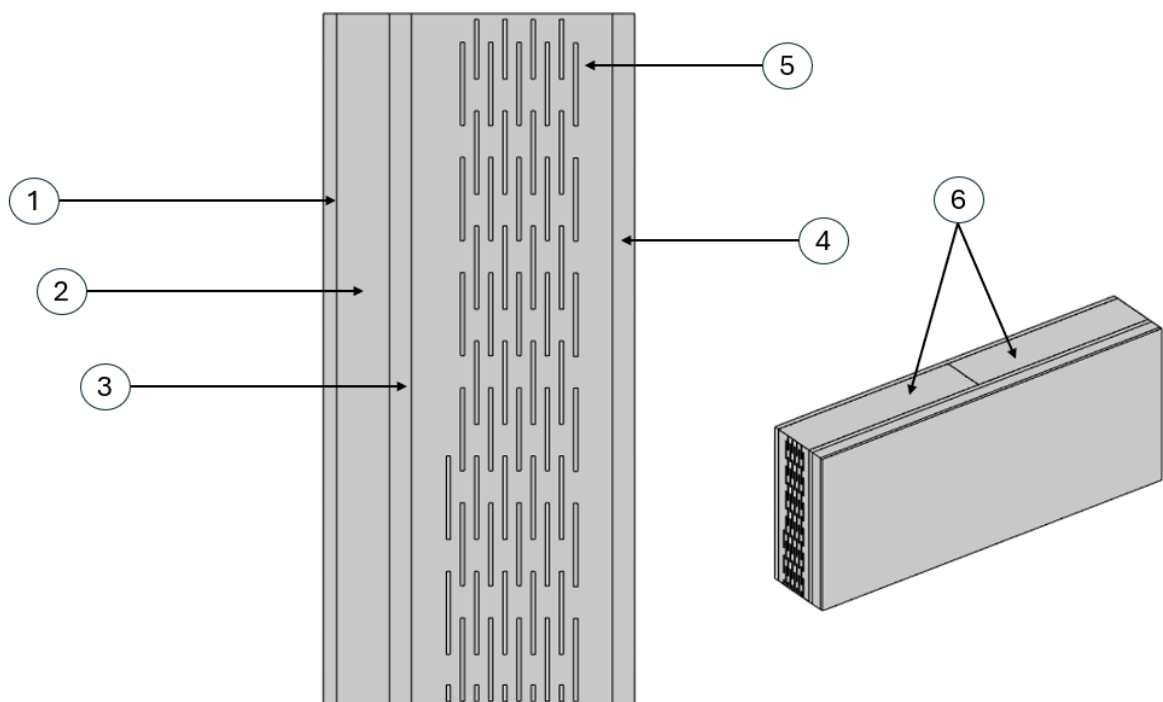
1 Configuration of wall panels with CFS sections with slits
